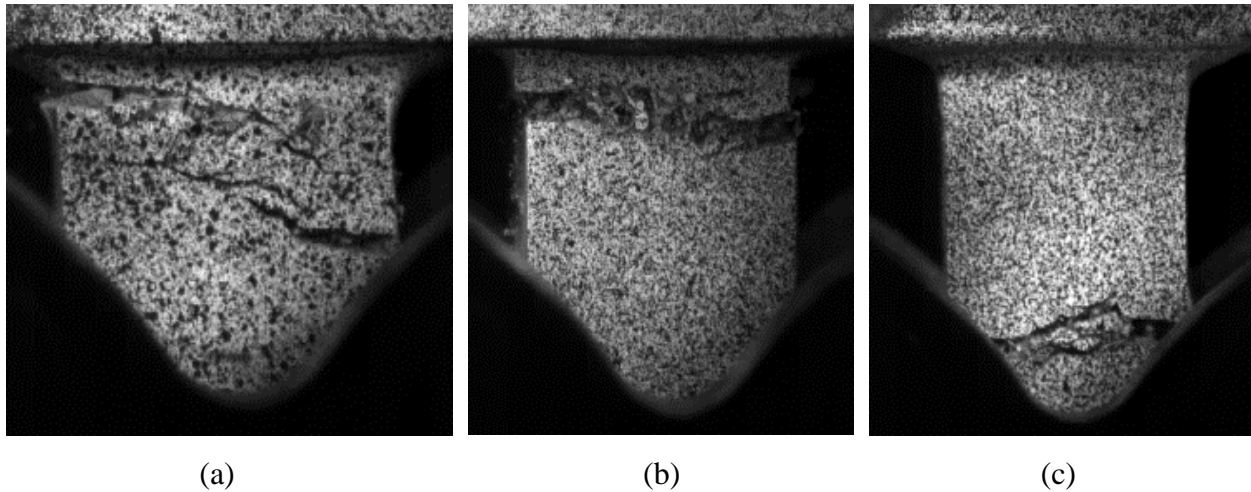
Examples of failure of UHP-FRC specimens in experiments: (a) $l = 55\text{mm}$; (b) $l = 60\text{mm}$; (c) $l = 65\text{mm}$ (note that the darker lower part of the photos is part of the gripping fixture of the machine)
